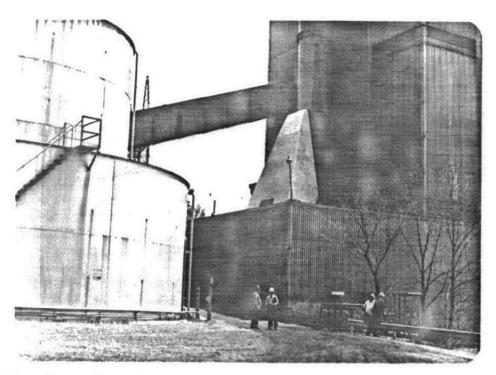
View from ground level facing southeast showing a portion of the oil storage facilities, boiler duct tie-in to the stack, and the coal conveyor.
